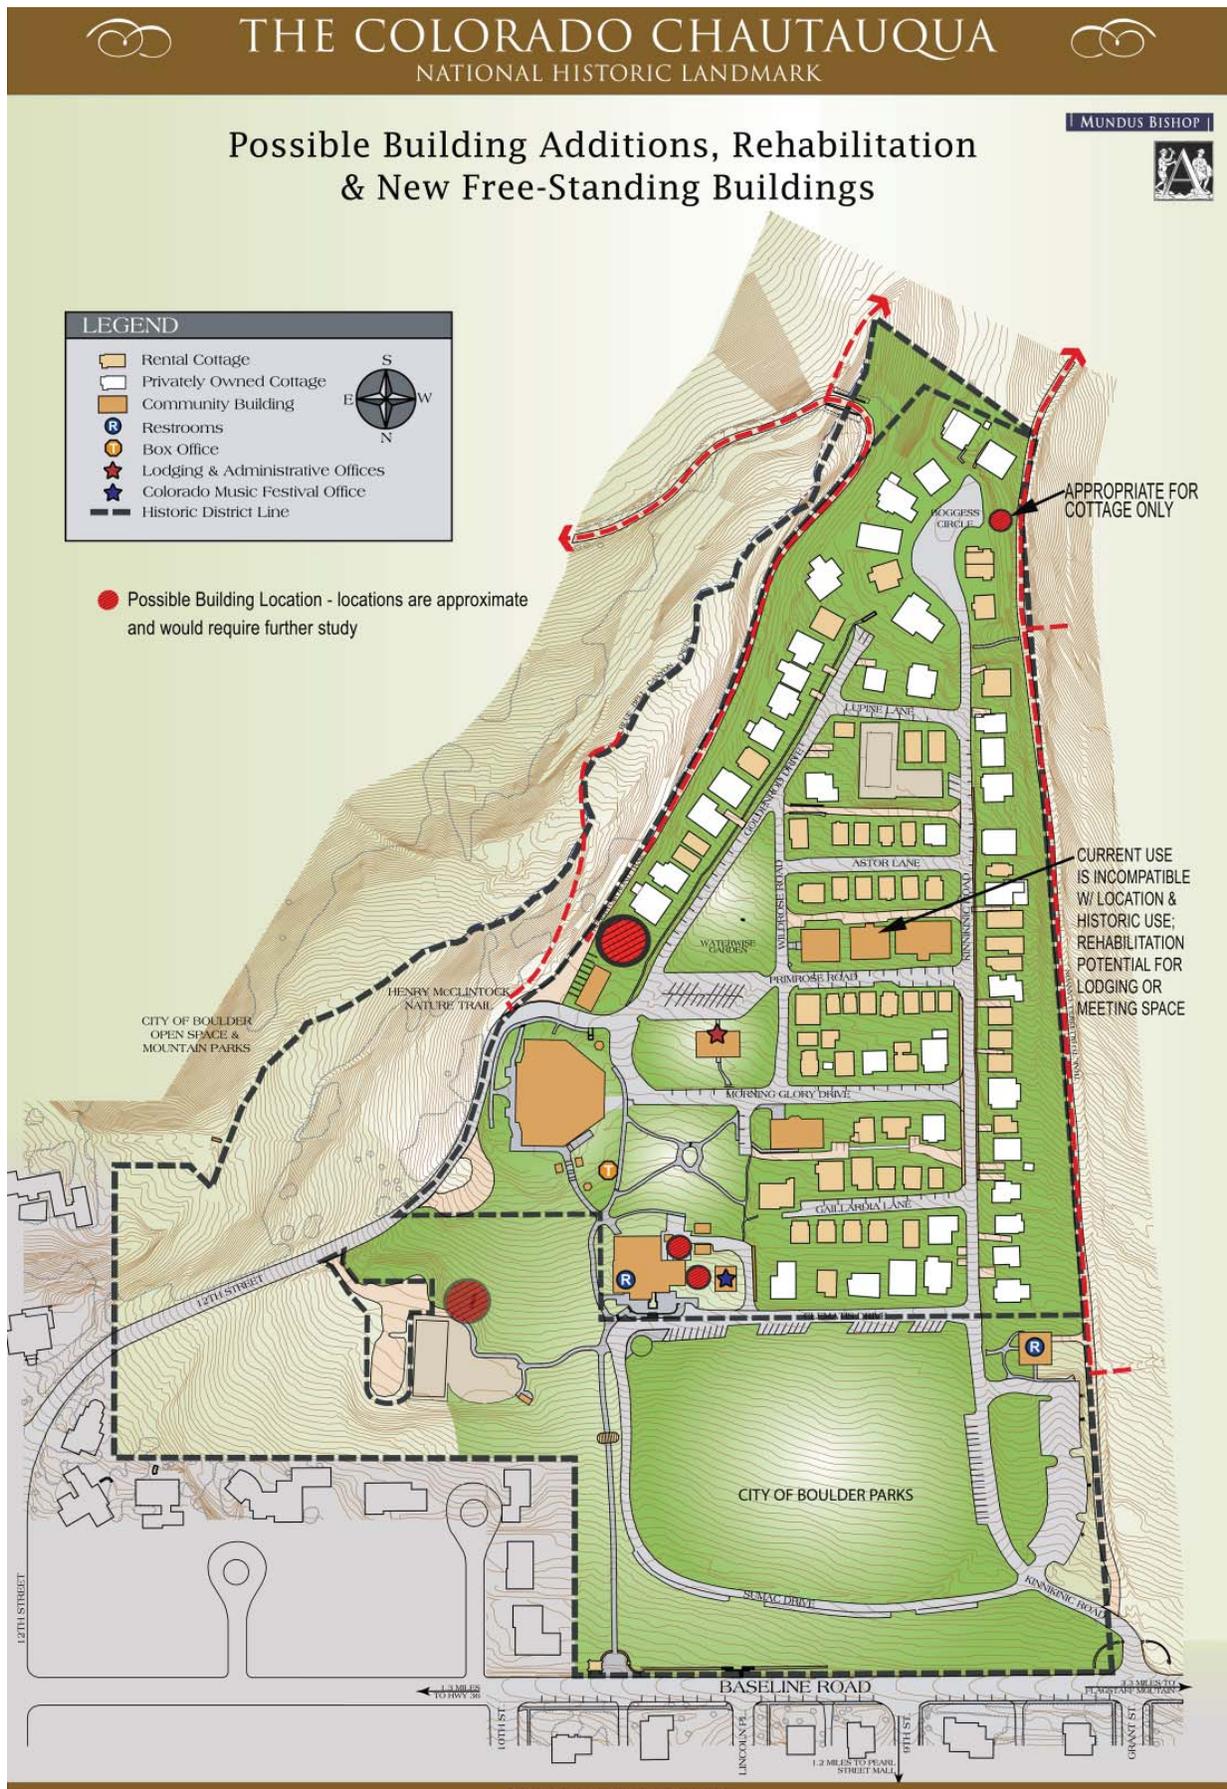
Possible Building Additions and New Free-Standing Buildings Diagram
